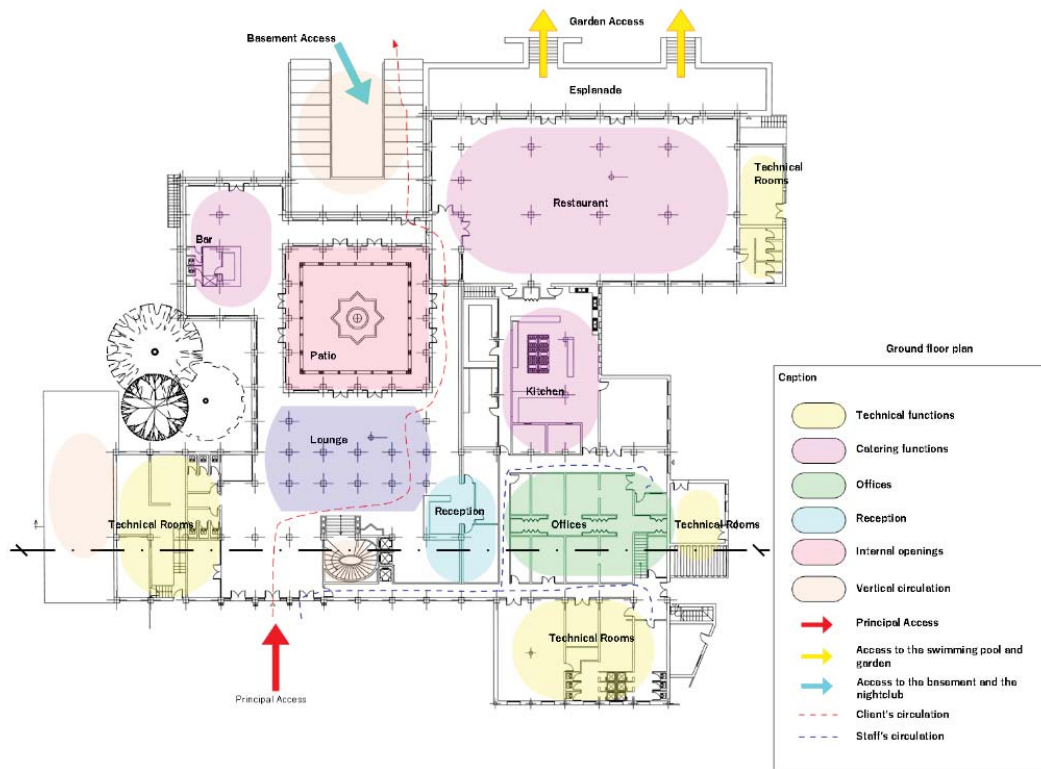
Ground Floor Plan (author's drawing, 2025). The plan shows the L-shaped composition organized around the central patio. It highlights the symmetrical structure of public spaces (lounge, reception, restaurant) and the spatial progression from the entrance to the garden
